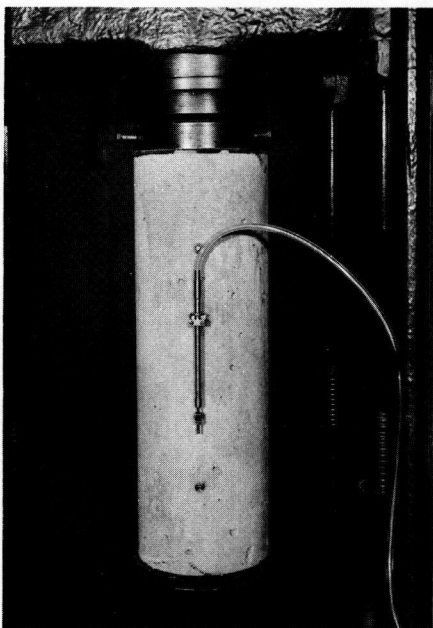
Gage attached to surface of 6- by 18-in. cylinder.
